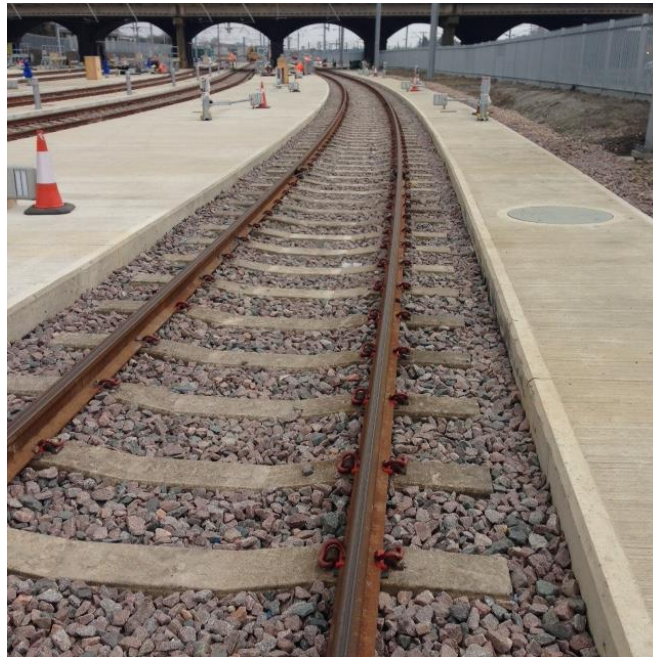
Serviceable concrete sleepers installed on stabling road No1
